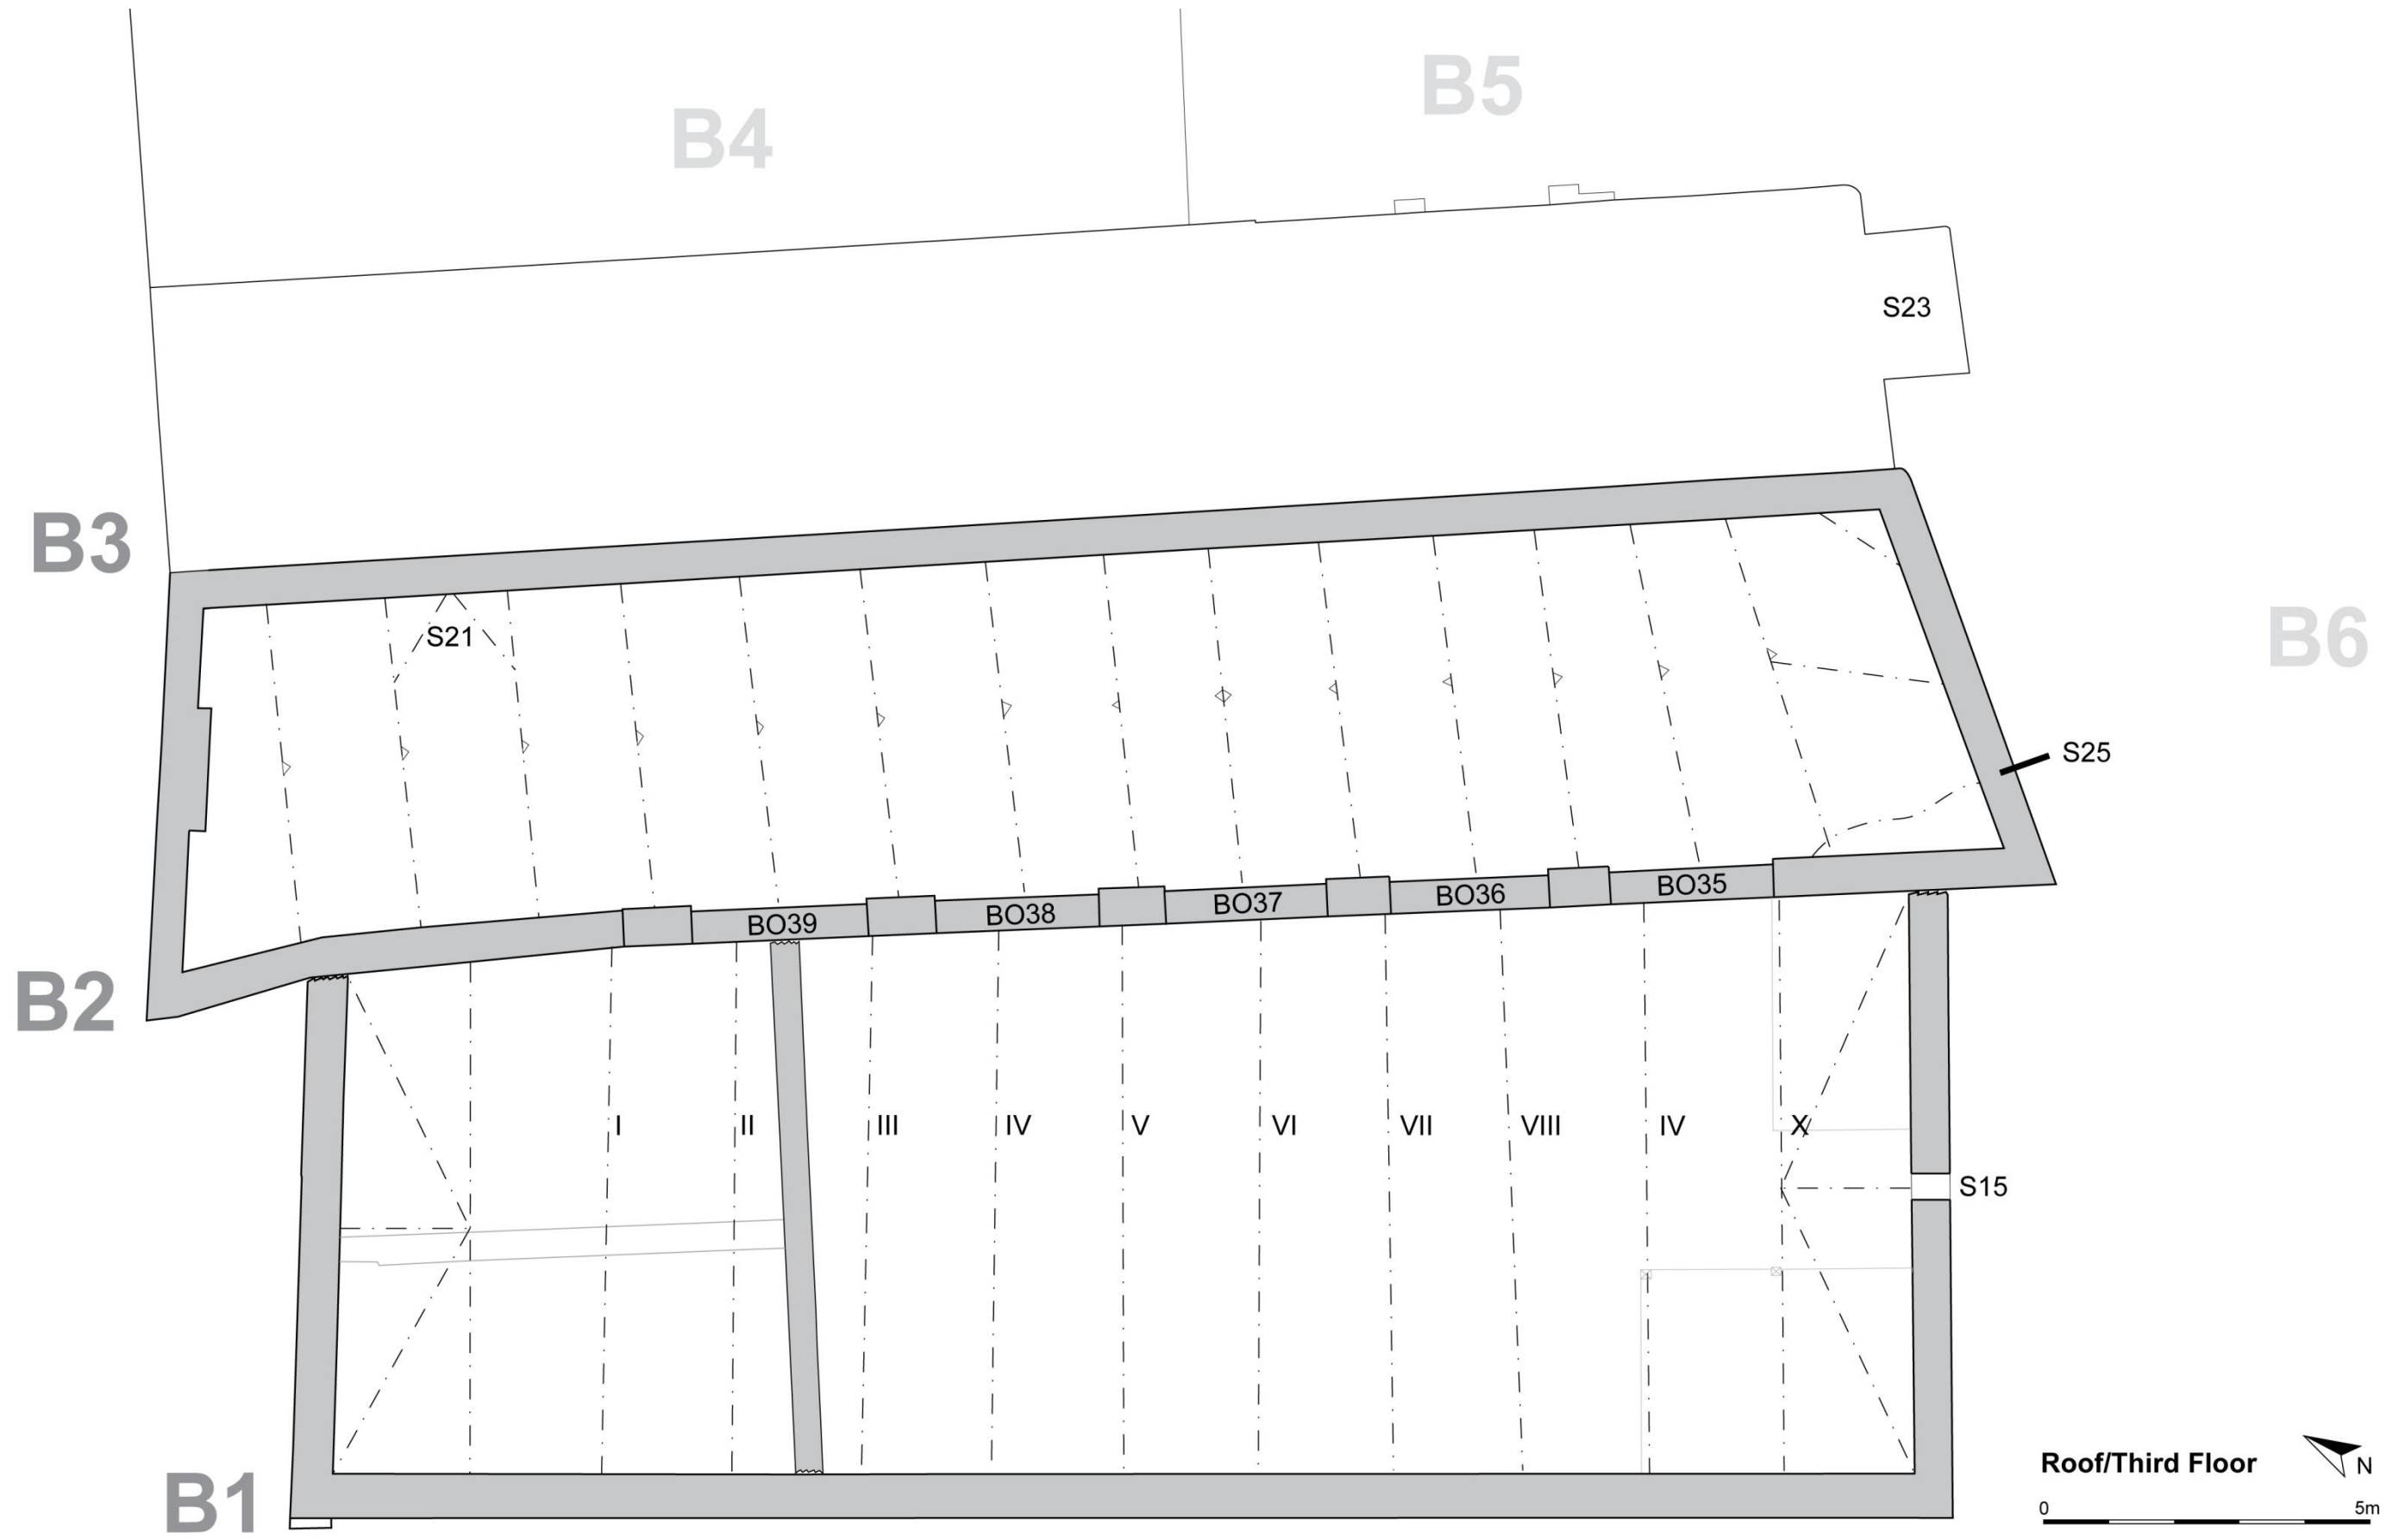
THIRD-FLOOR/ROOF SPACE PLAN OF B1-B3 SHOWING DOORS (Dx), WINDOWS (Wx), FIRE PLACES (FPx), BLOCKED OPENINGS (BOx) AND SIGNIFICANT FEATURES (Sx). THE ROOF TRUSSES IN B1 FEATURE CARPENTER'S MARKS AS SHOWN.
